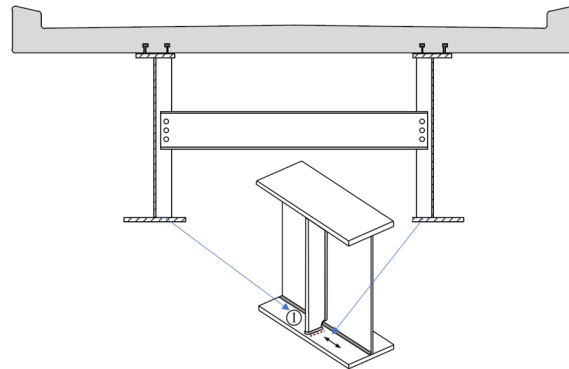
Cross-section of the road bridge girders, the concrete deck, and the transverse detail under study. Figure adapted from [17].
